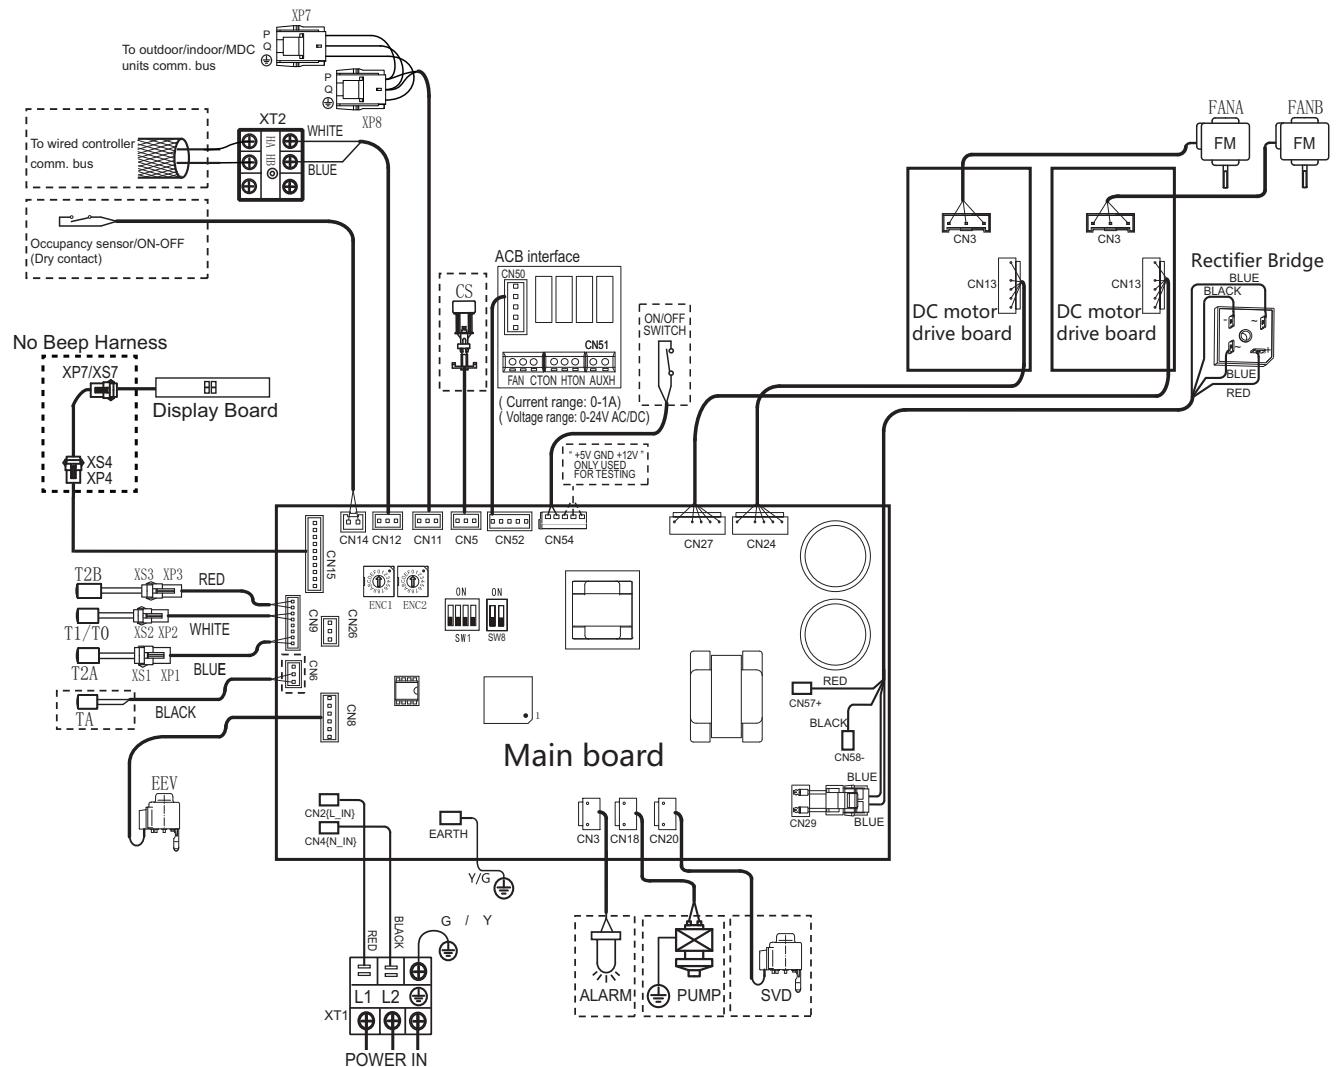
40VMH072 - 096 Typical Wiring Diagram
